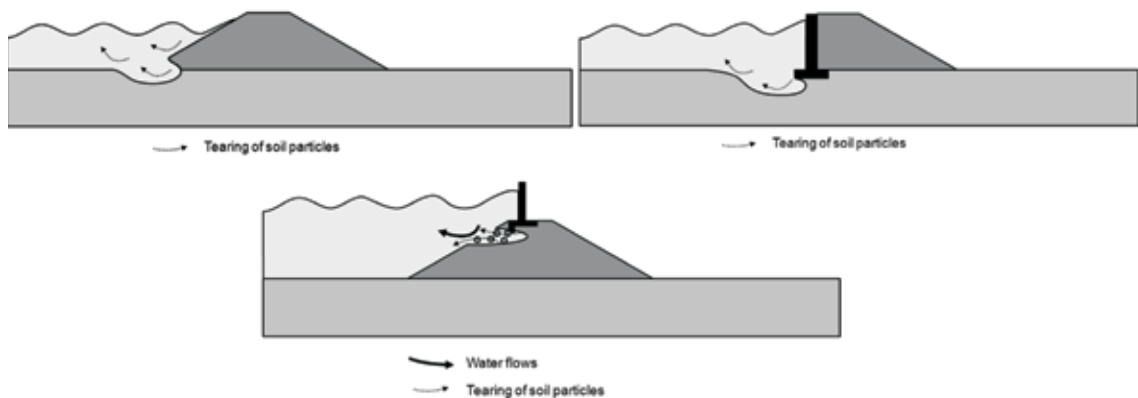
External erosion of the toe and foundation of a levee (bank caving) (courtesy Y Deniaud, CETMEF)
